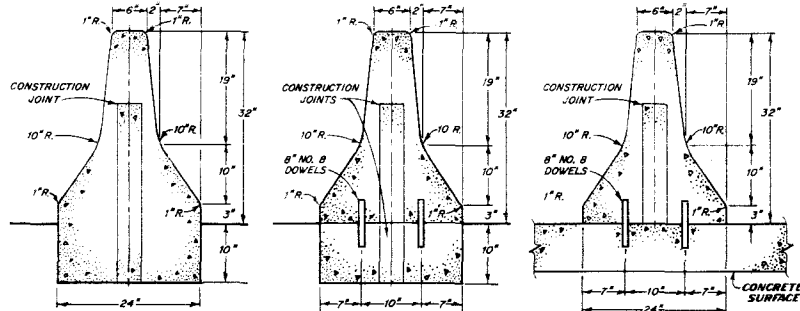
DETAILS FOR CAST IN PLACE CONCRETE BARRIER STANDARD M-606-12
